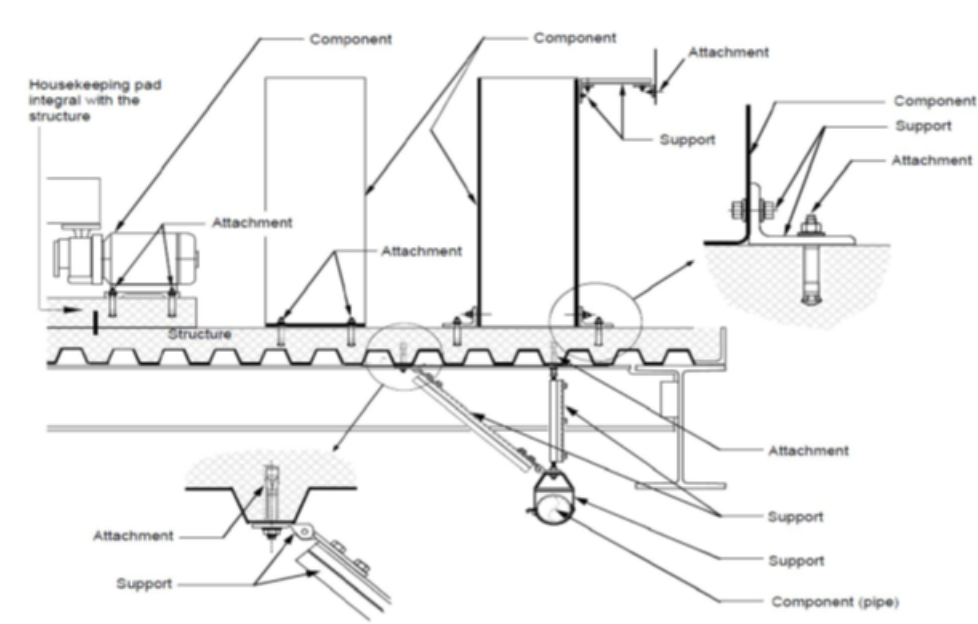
Approved equipment anchorage in CBC 2010.
